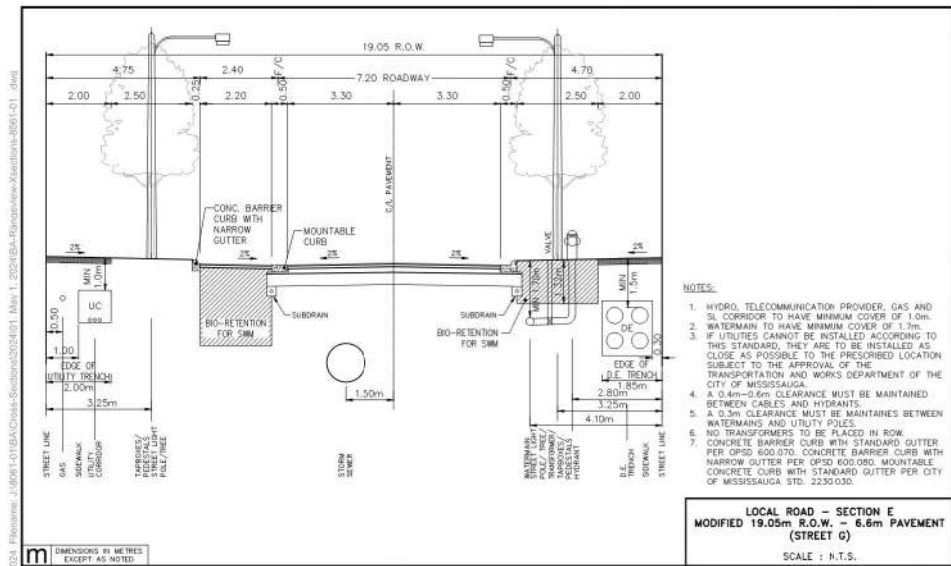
PROPOSED STREET 'G' EXTENSION - FUNCTIONAL PLAN & CROSS-SECTIONS
